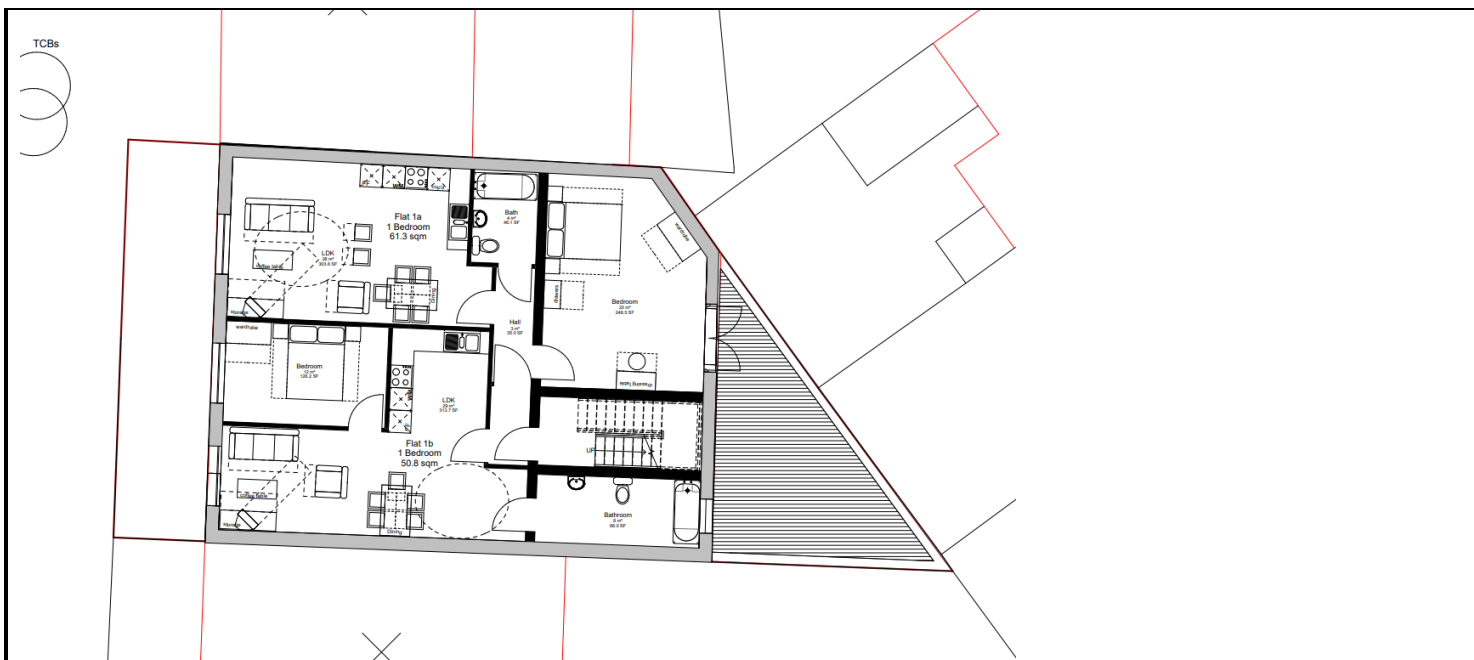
Lower ground floor basement plan as approved under 2016/1334/P
